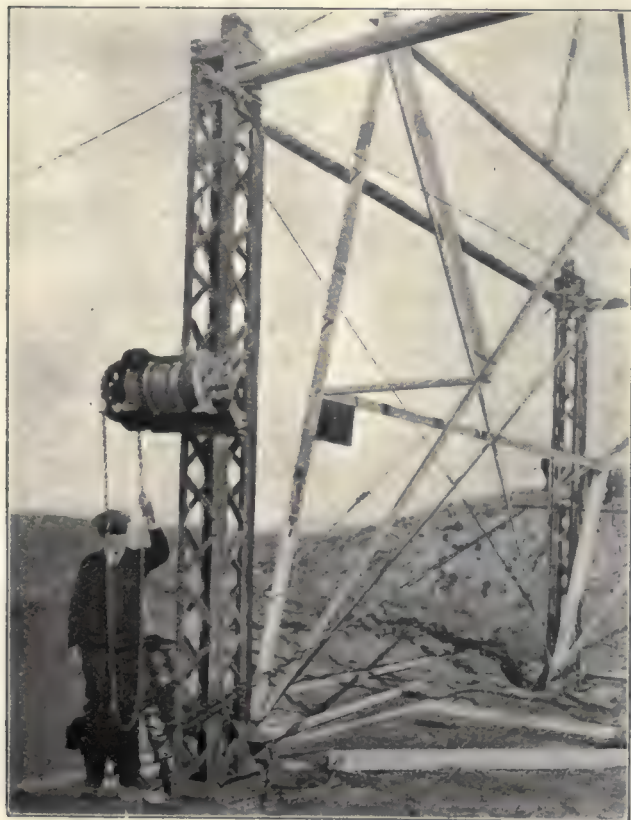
STEEL TOWERS WERE RAISED BODILY WITH THIS ELEVATOR AND A 10-FT. SECTION WAS PLACED UNDERNEATH
